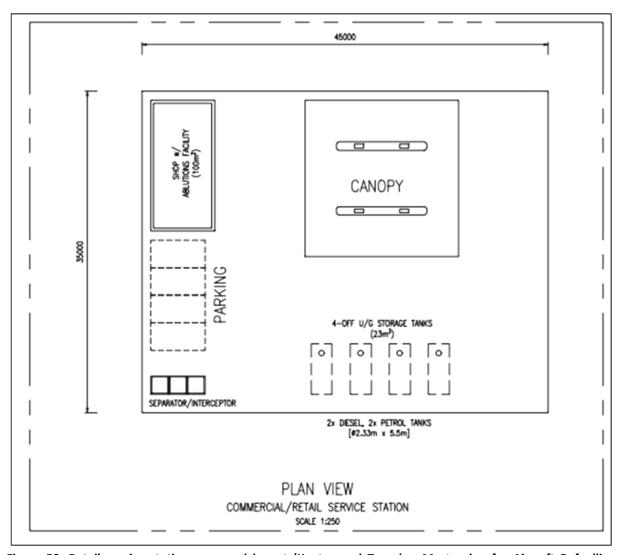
Retail service station proposed layout (Kantey and Templar, Masterplan for Aircraft Refuelling Facilities; May 2023)
